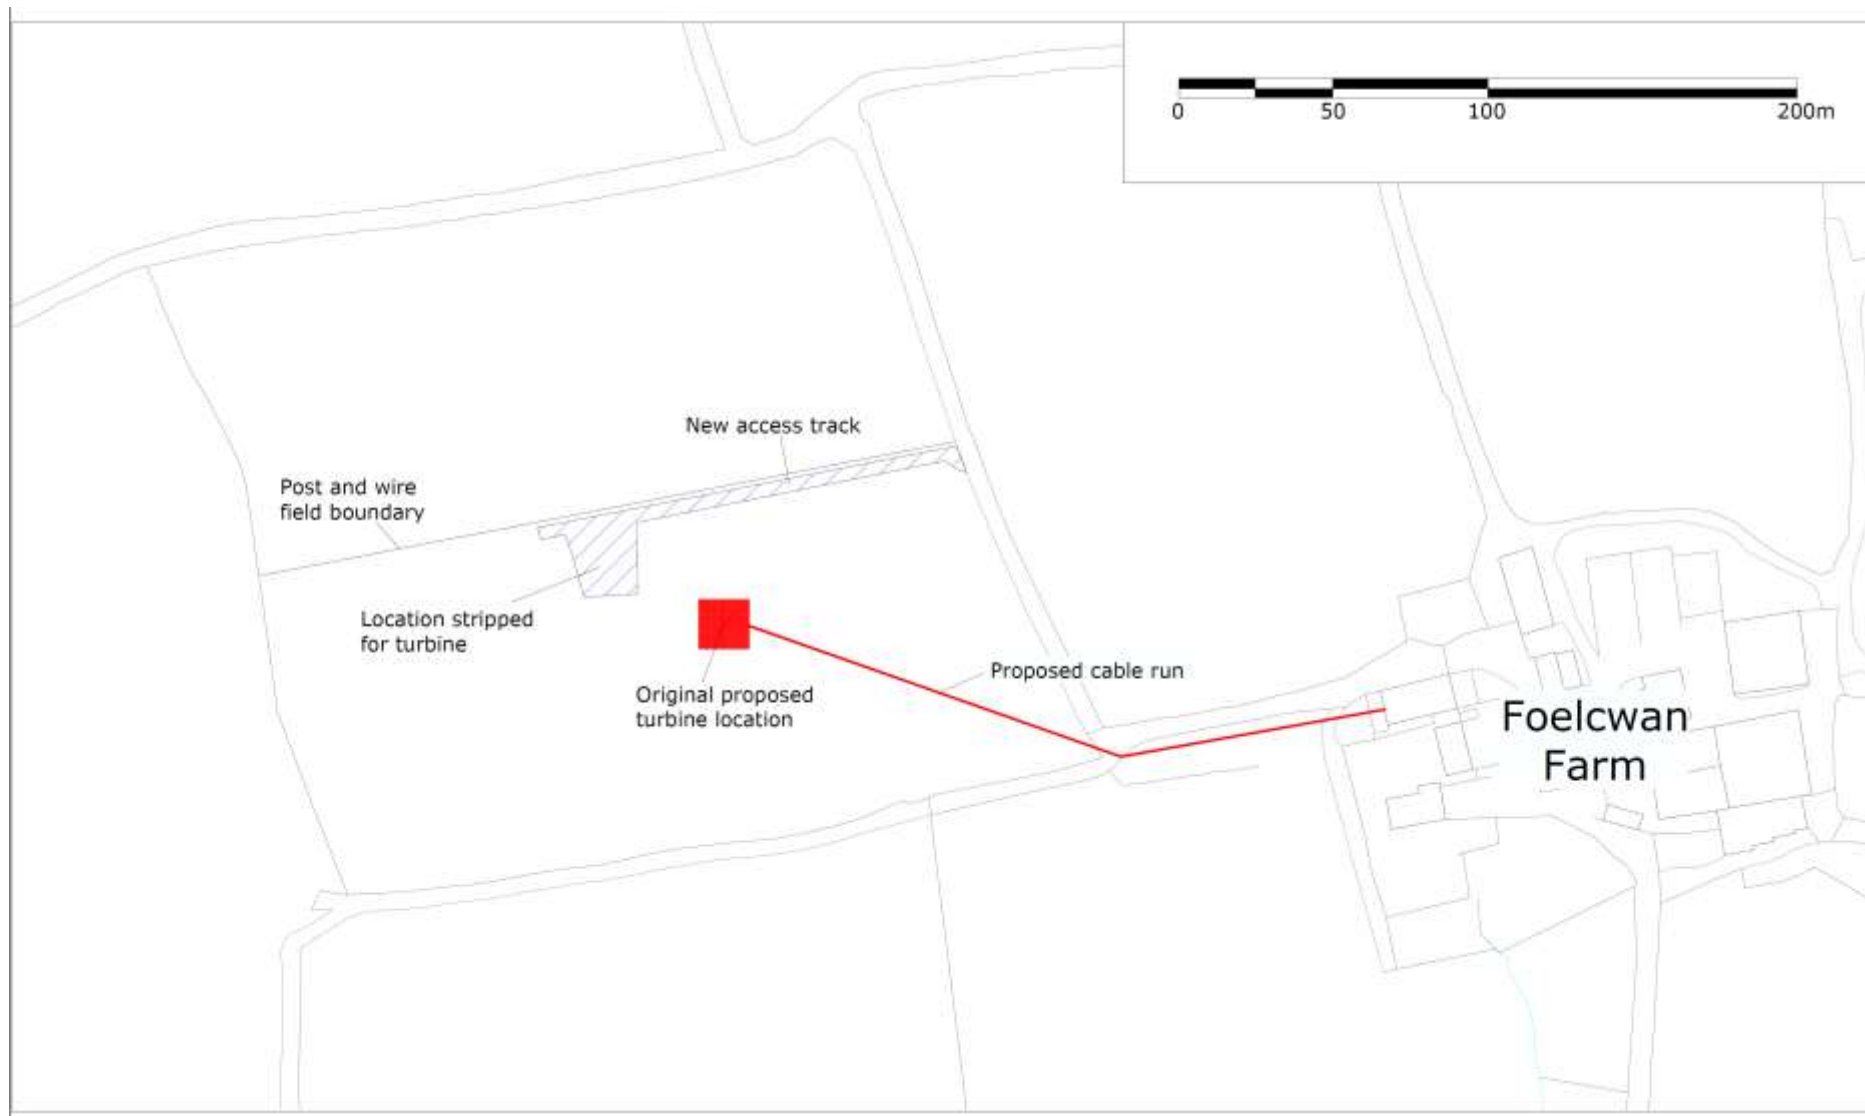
Detailed site location plan, area of watching brief and original proposed turbine location
